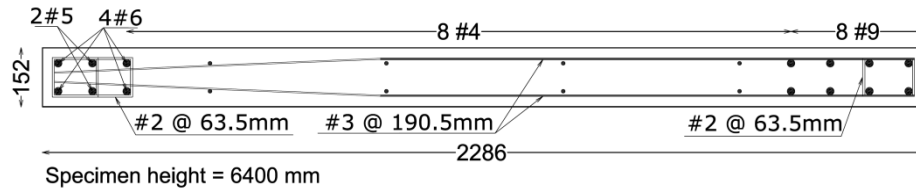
Cross section and reinforcement layout of RWN (Johnson 2010)
